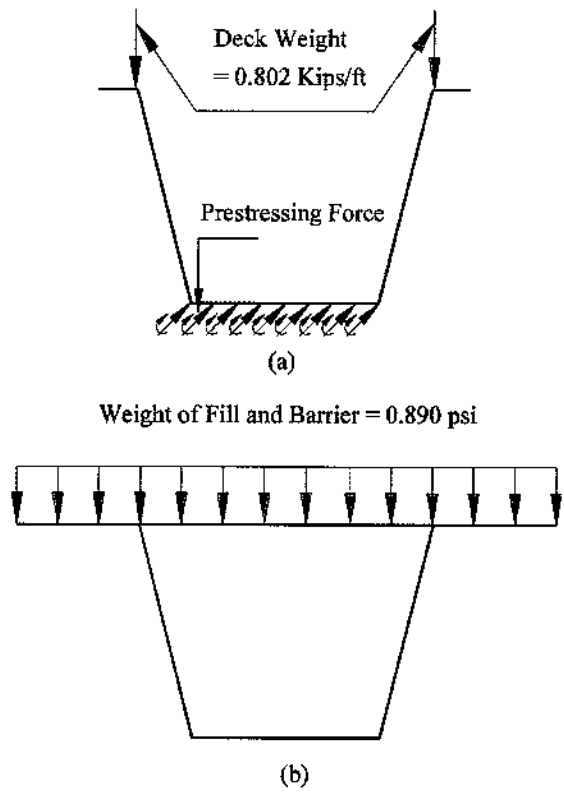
Loading Stages, (a) First Loading Stage, (b) Second Loading Stage
